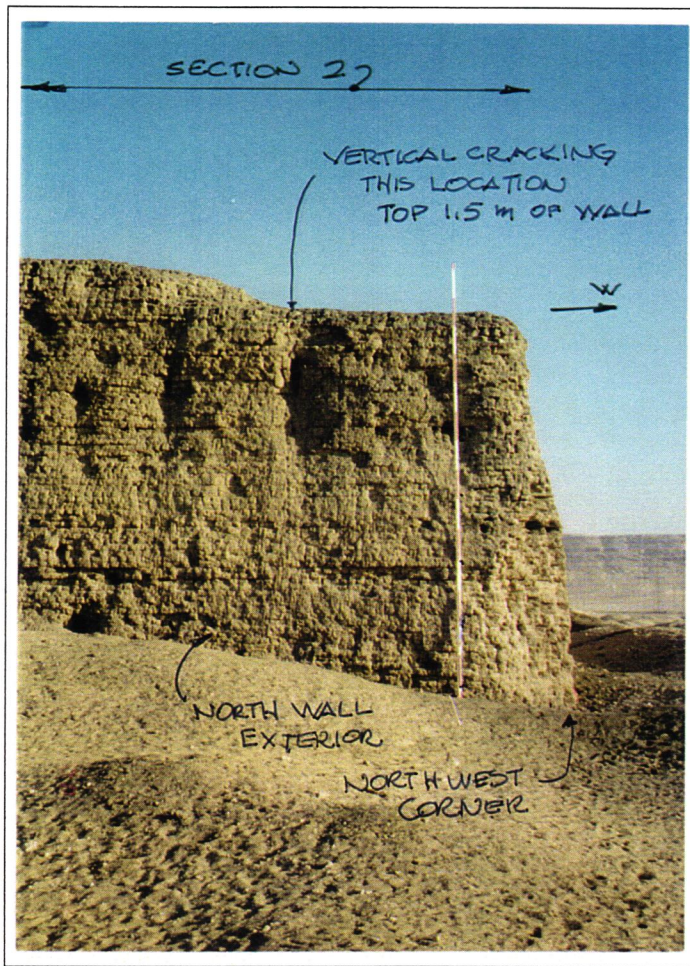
Conditions Near Central Failure North Main Enclosure Wall
